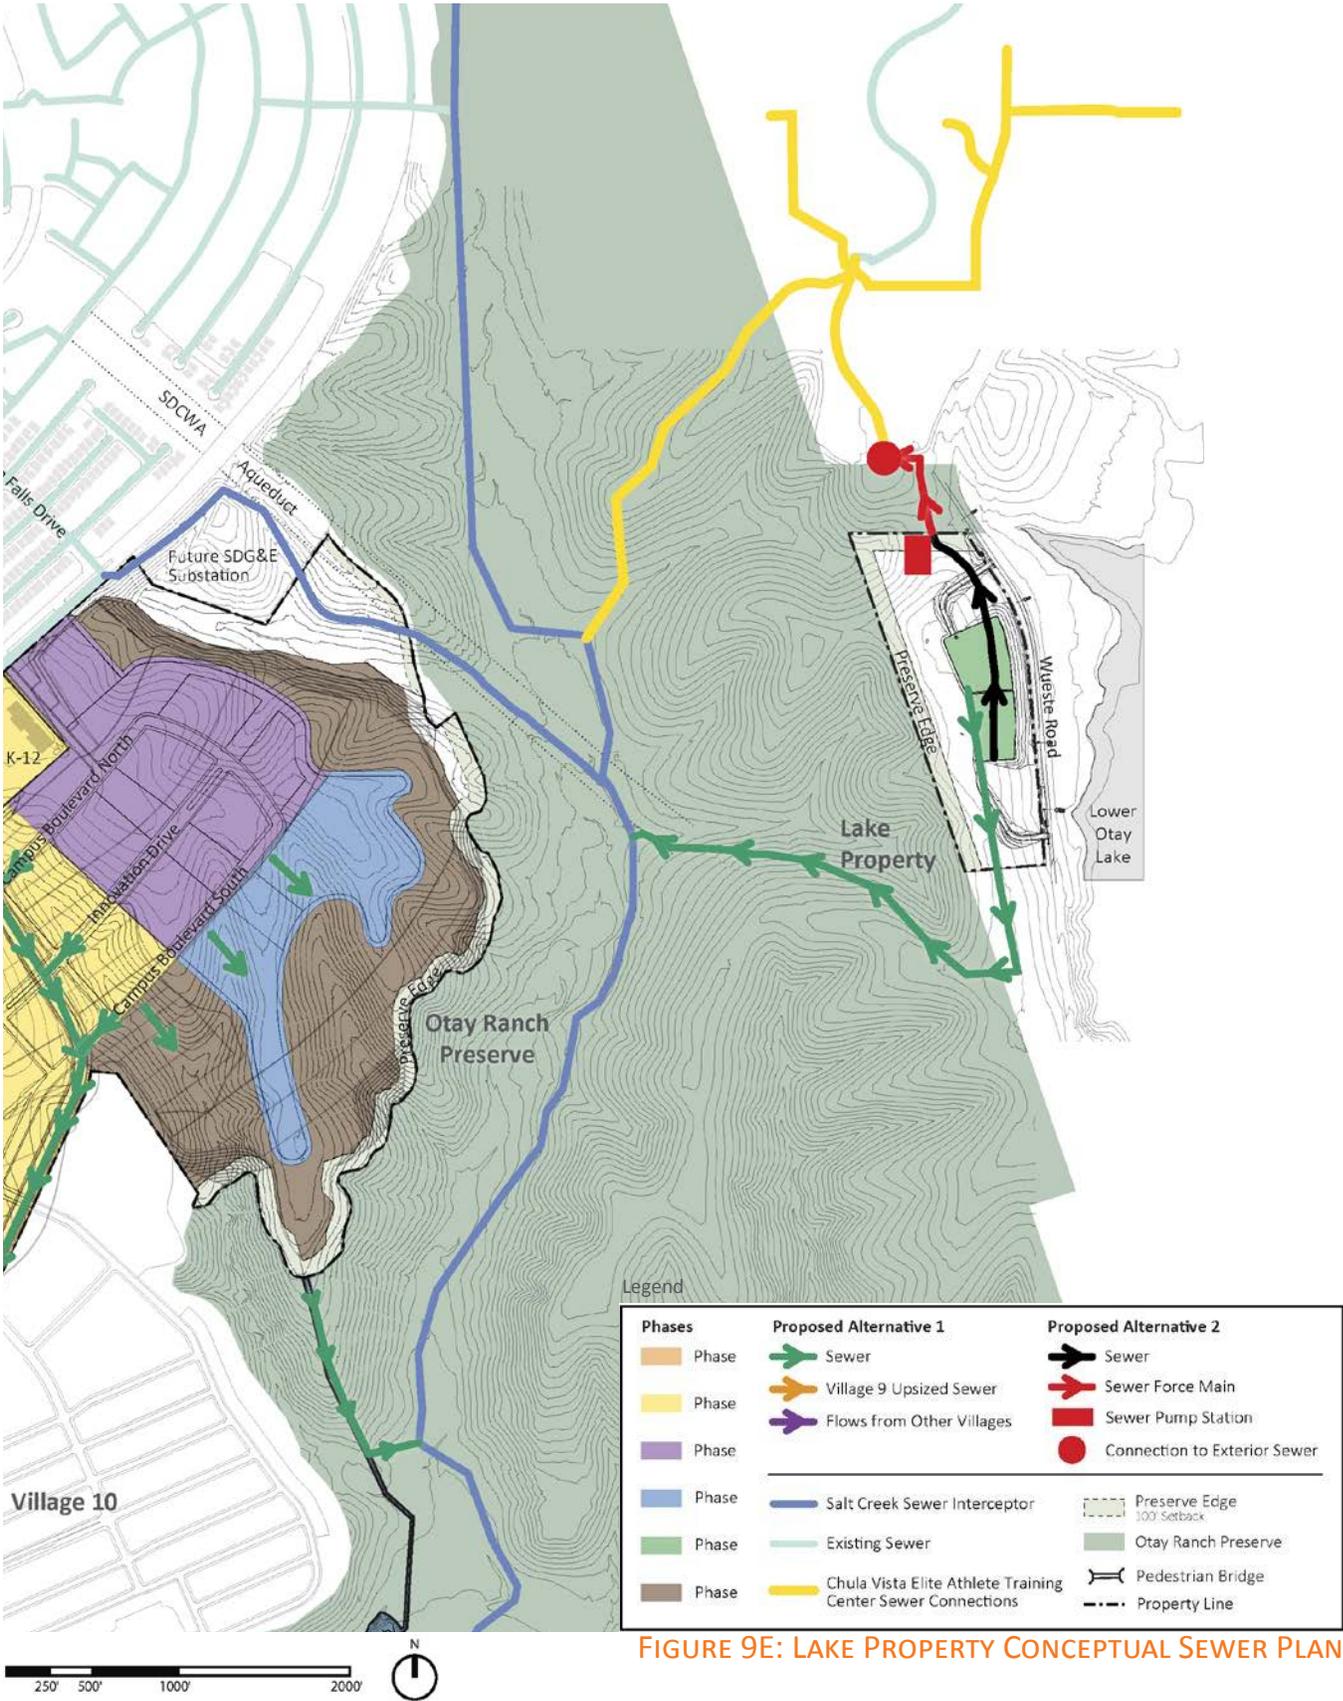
E: LAKE PROPERTY CONCEPTUAL SEWER PLAN
